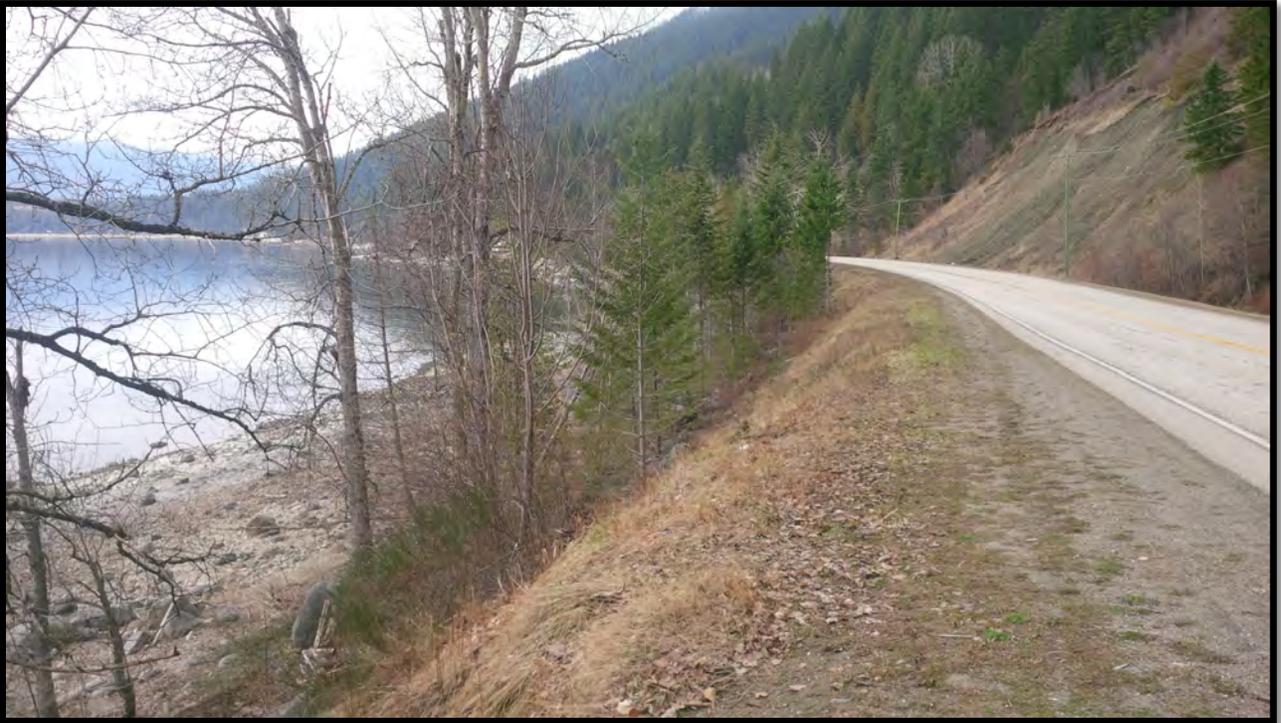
View of Highway 31 and the start of the proposed access road looking southwest.
